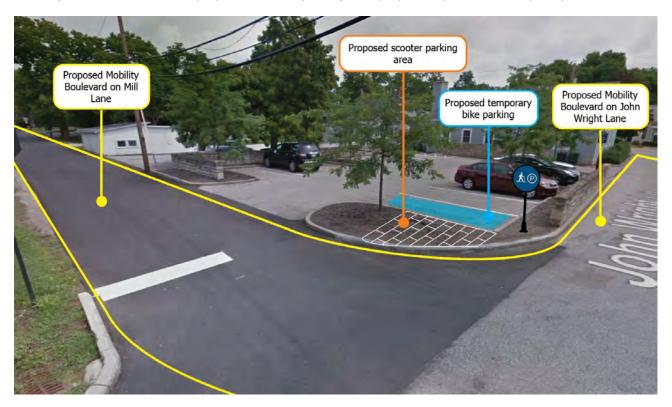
Street view of proposed scooter parking with proposed space for a temporary bike rack
